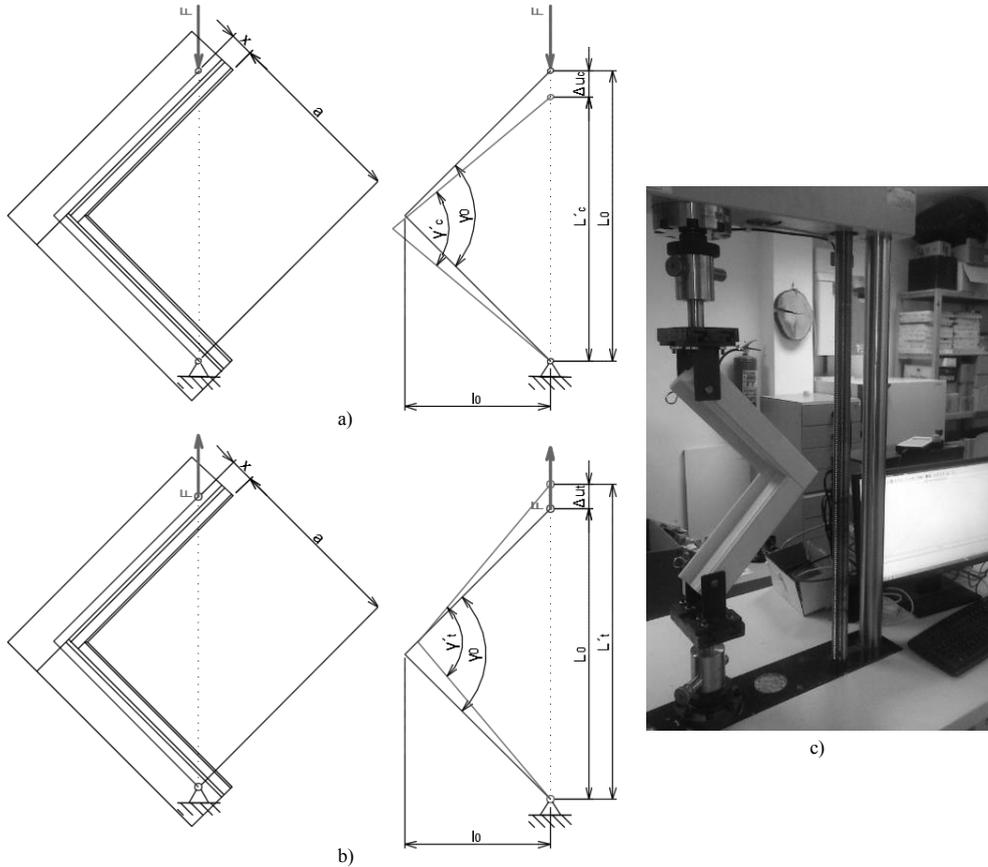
a) Compression testing, b) tensile testing, c) testing set-up (Author)
